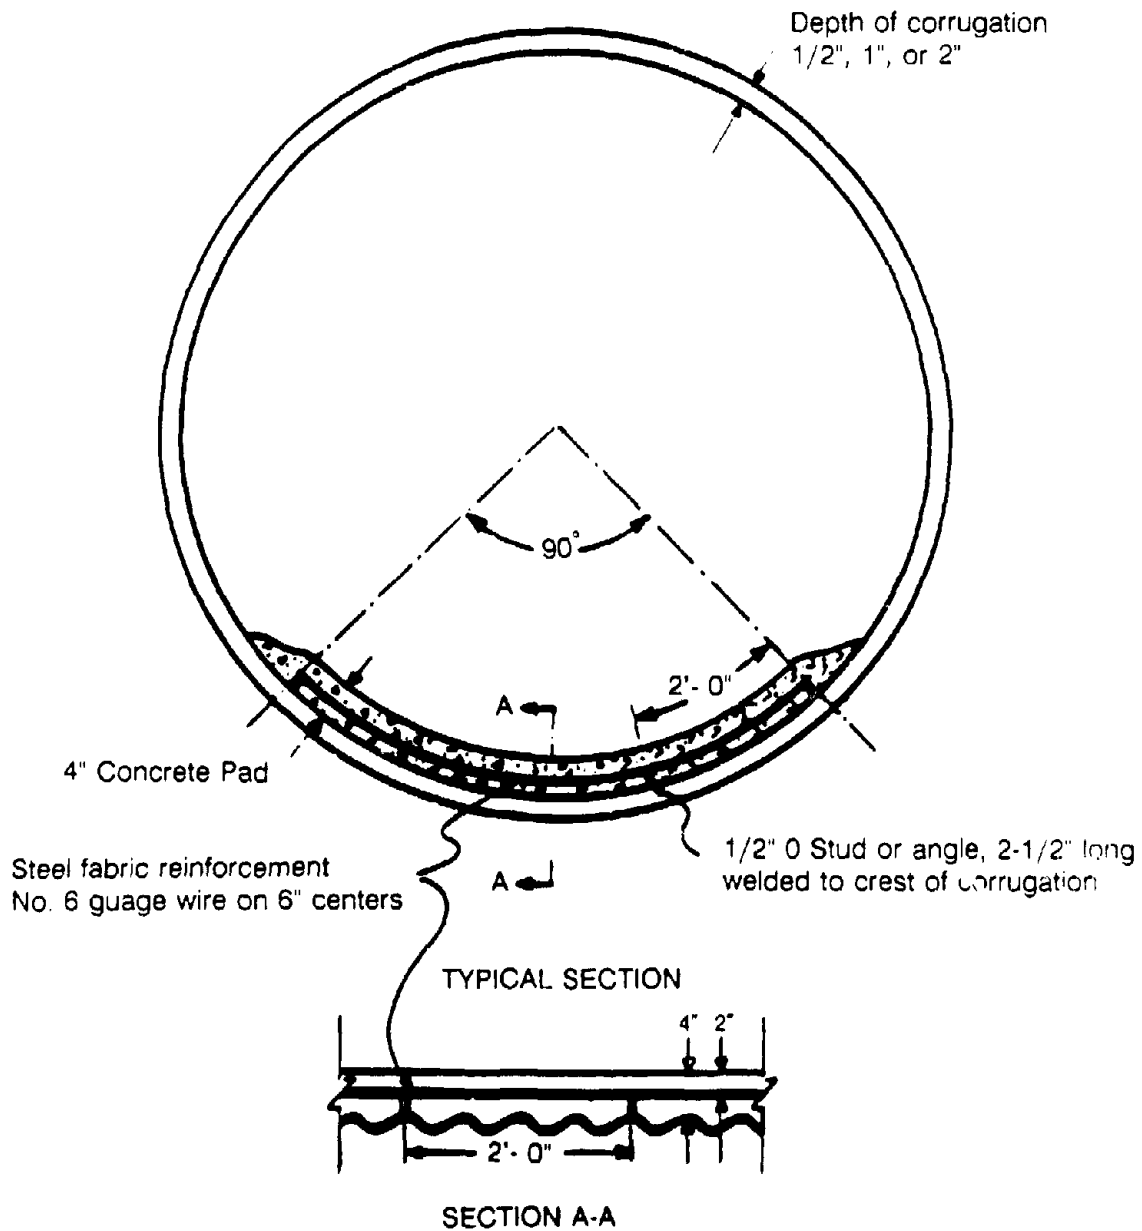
Reinforced concrete invert paving for corrugated steel pipe.⁽³⁾
